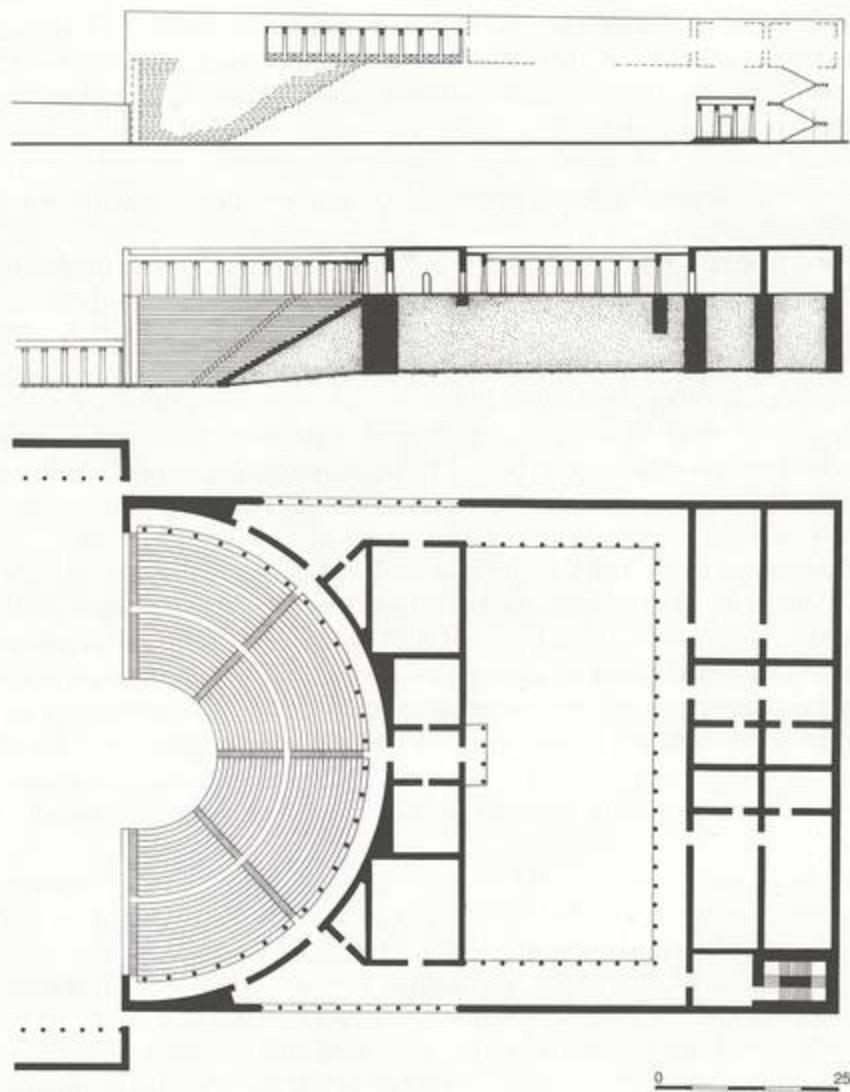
Restored plan, section, and eastern elevation of the original Herodian building whose remains comprise Tell es Samrat
